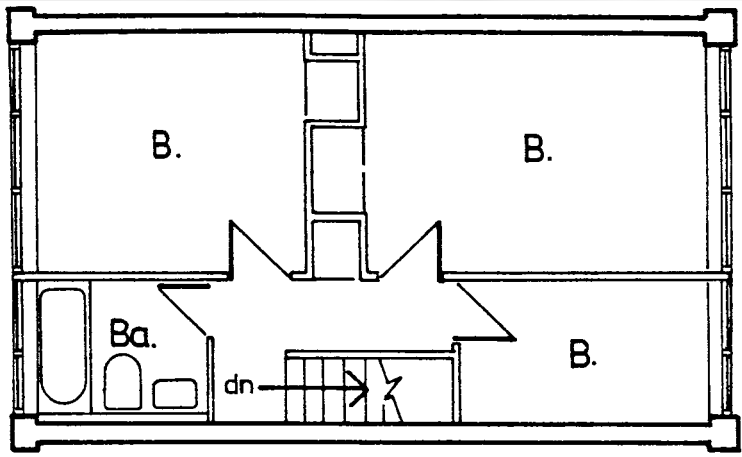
'SPAN' TYPE T8 TERRACE HOUSE 1960.
